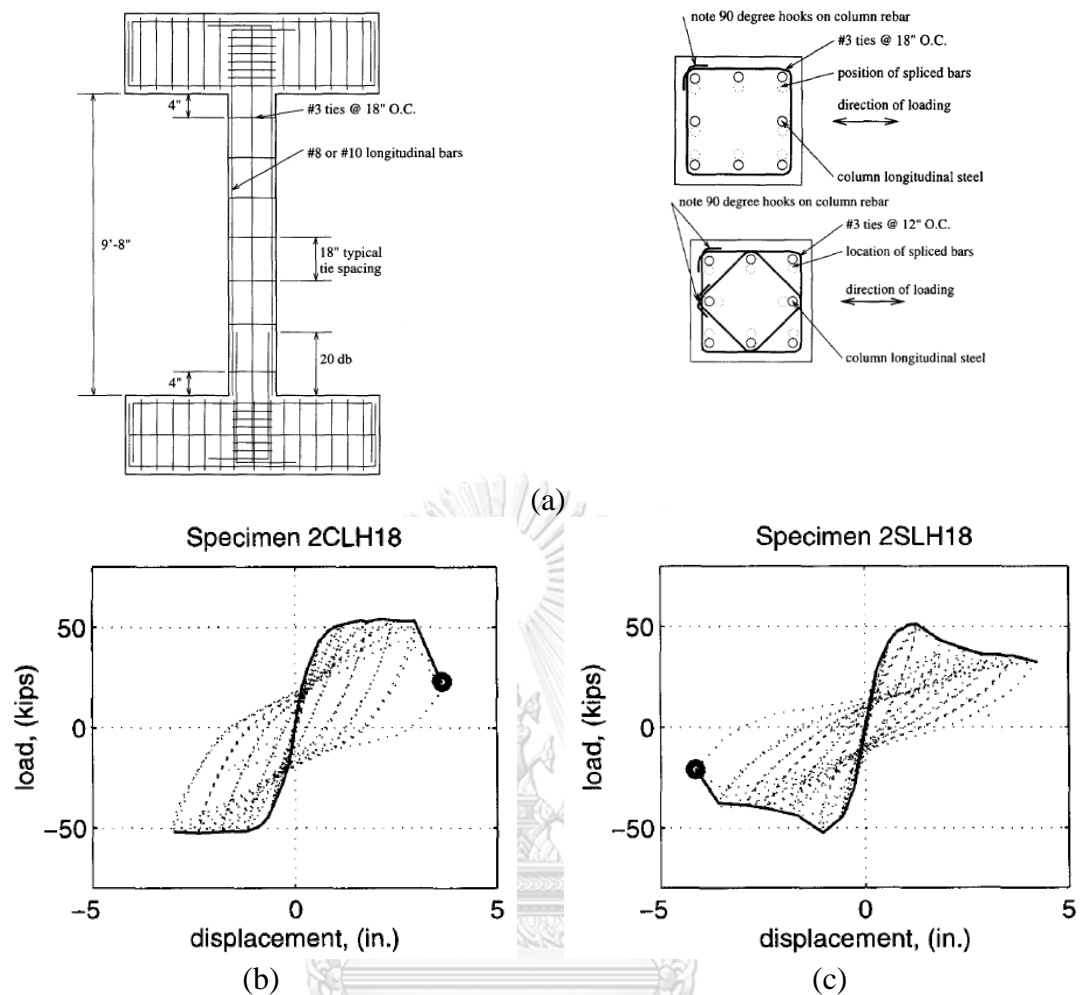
RC columns tested by Lynn et al. [60] (a) details, (b) with continuous reinforcement into the footing, and (c) with a substandard lap splice.
